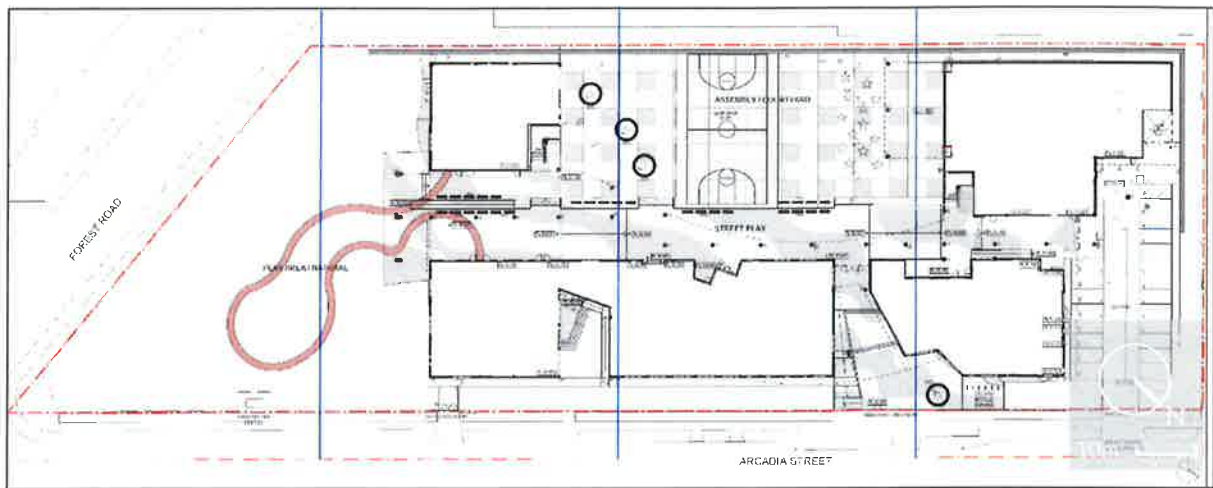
| Proposed site plan (Source: Applicant's EIS 2018).
